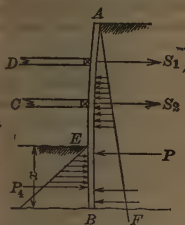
Length of Sheet piling and Dimensions of Braces
